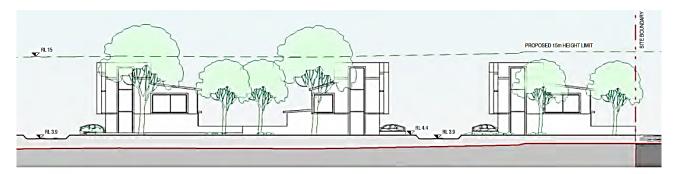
Elevation to Boondah Rd, north end of site next to Meriton complex (extract Buchan Group report)
